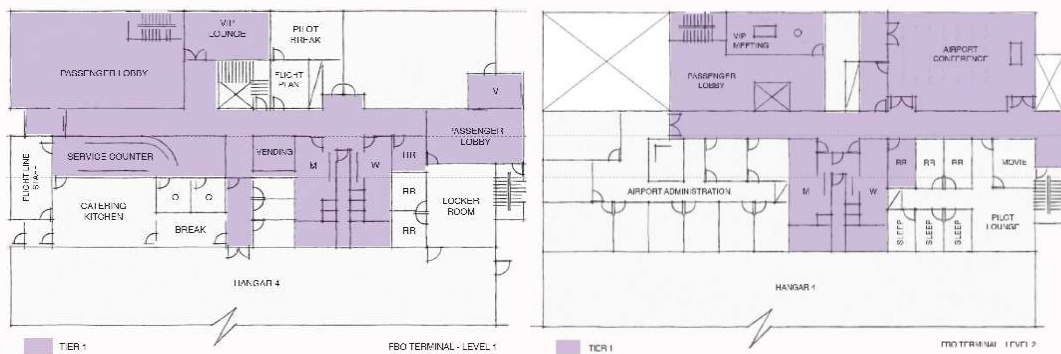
Tier 1 Key Plan (First Floor & Second Floor)
